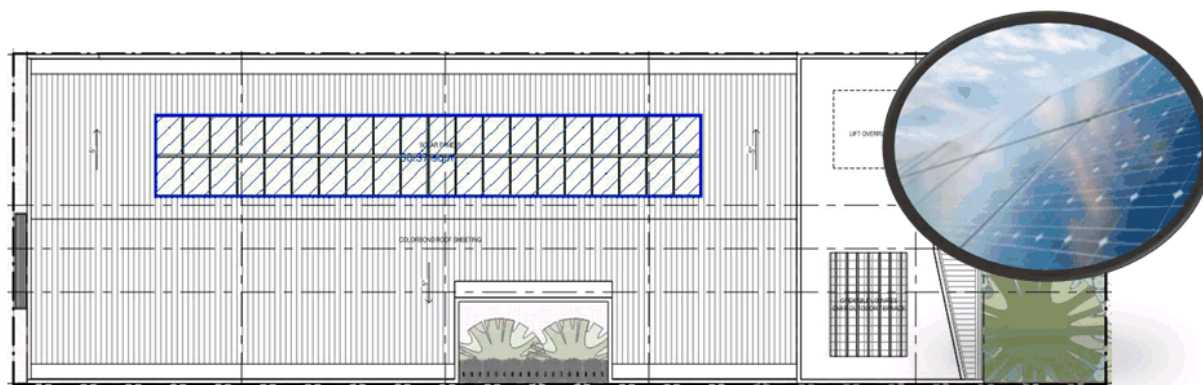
Proposed rooftop layout with indicative PV panel provisions
